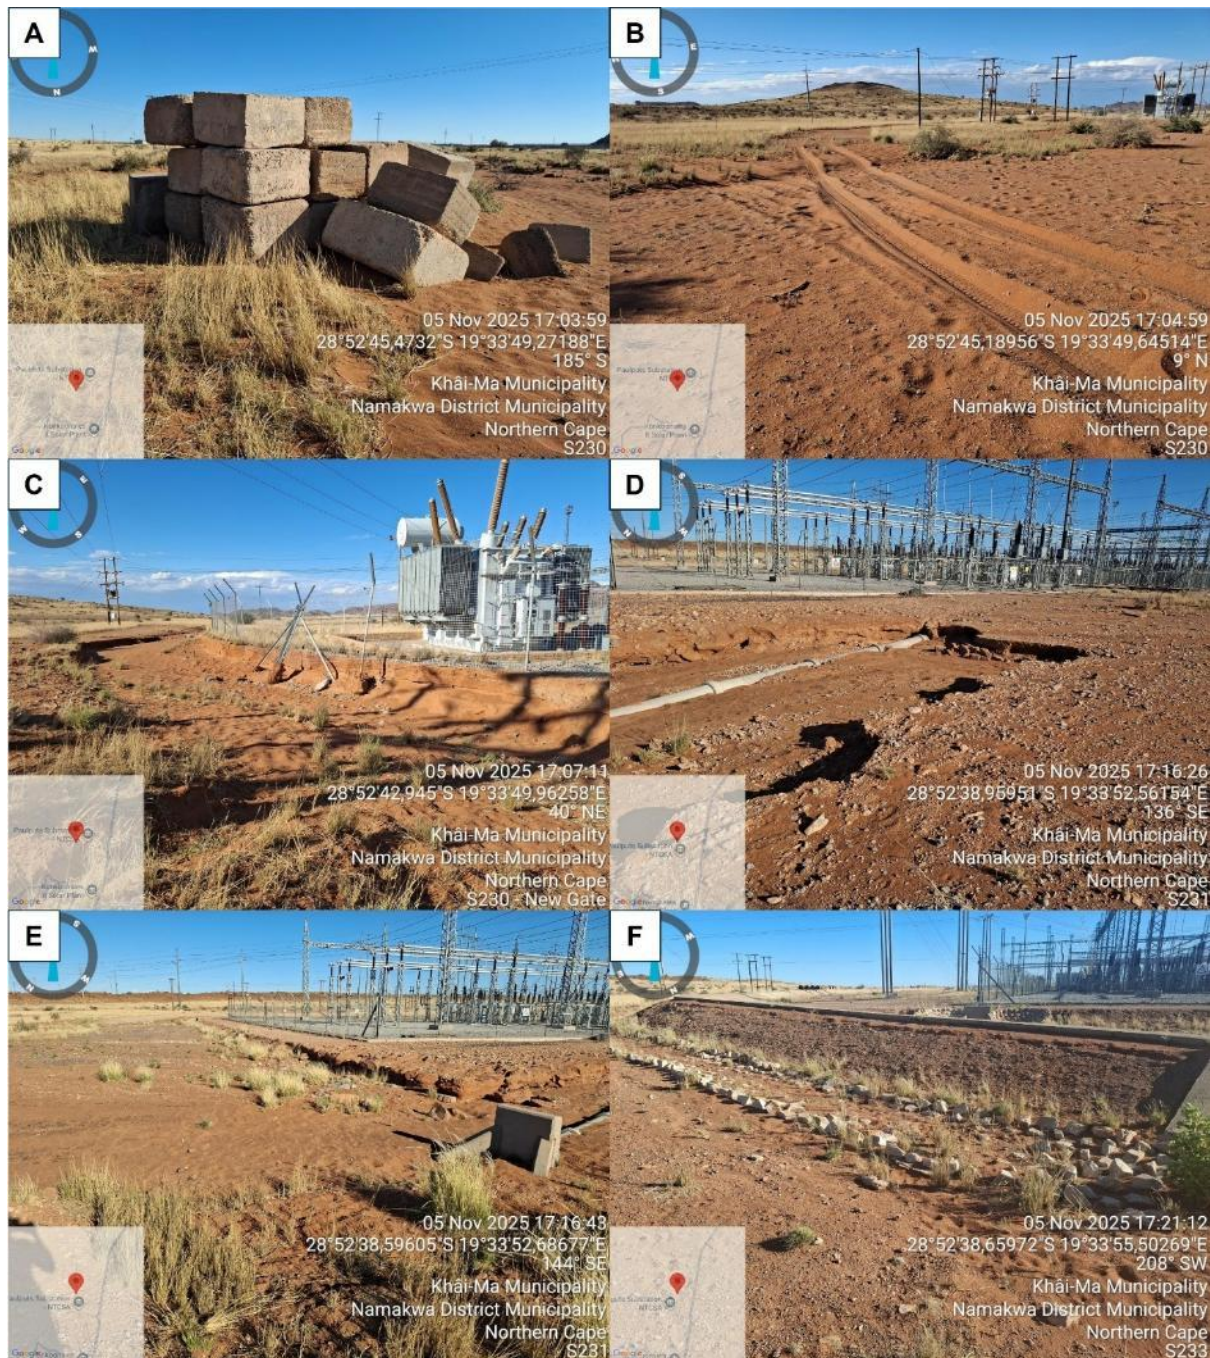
Impacts observed within the PAOI surrounding the Substation drainage area (November 2025): A) Building rubble; B) Dirt roads; C) Erosion; D) Pipes; E) Infrastructure (Substation and culverts) and F) Hardened surfaces (Berms and stormwater management systems)
